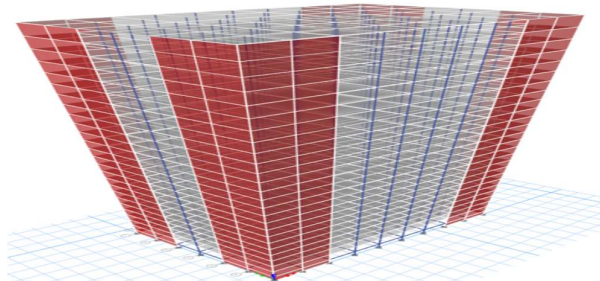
3D view of bare frame model having shear wall along X and Y-direction
